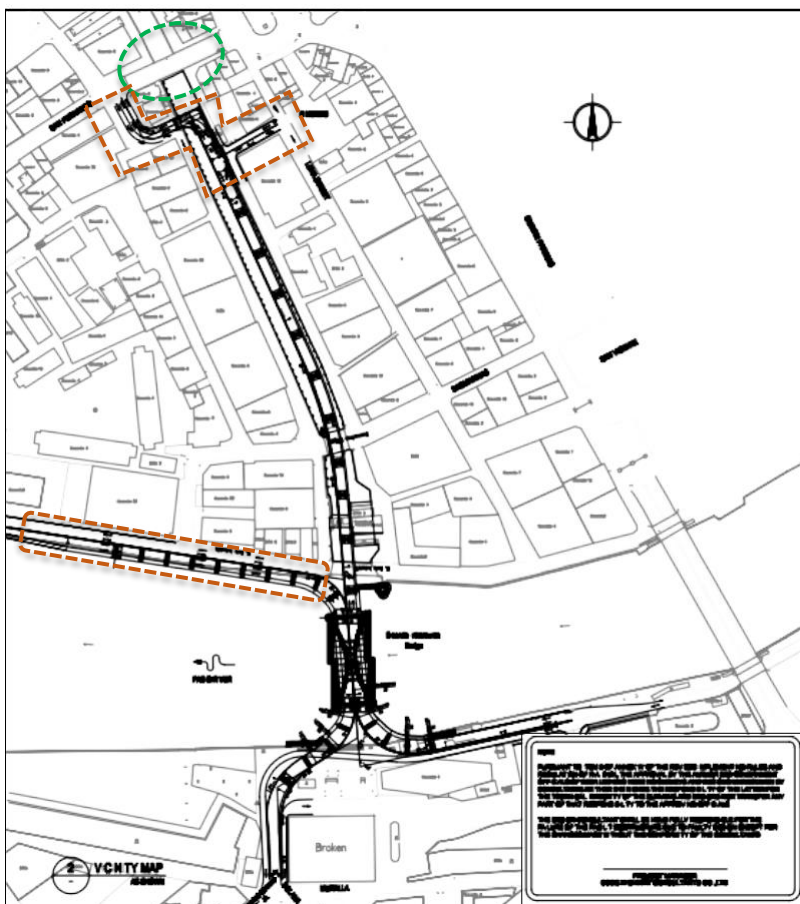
Site map shows the final design of BIB which avoided San Fernando Bridge (as encircled in green). The road leading to Binondo was shortened and a split-type ramp was introduced. (Source: Heritage Impact Assessment Report, 2020)
